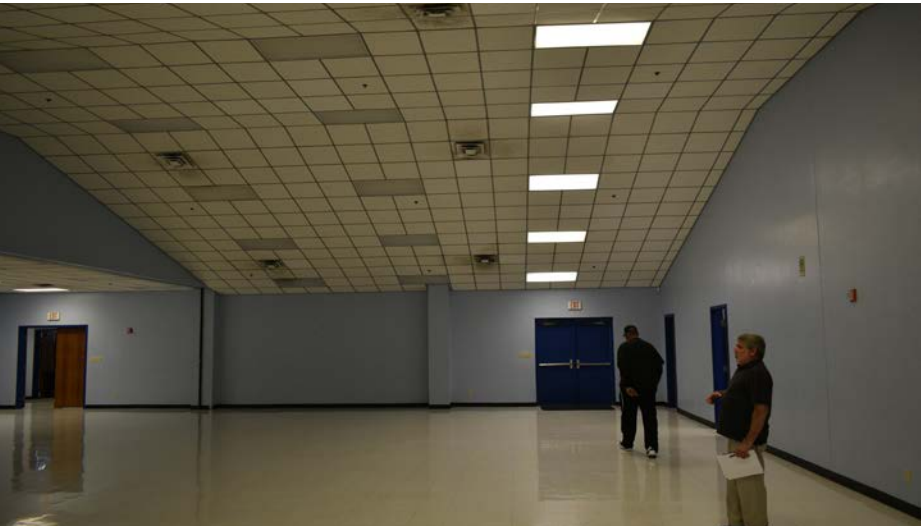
Multi-purpose room needs flooring, ceiling, lighting
